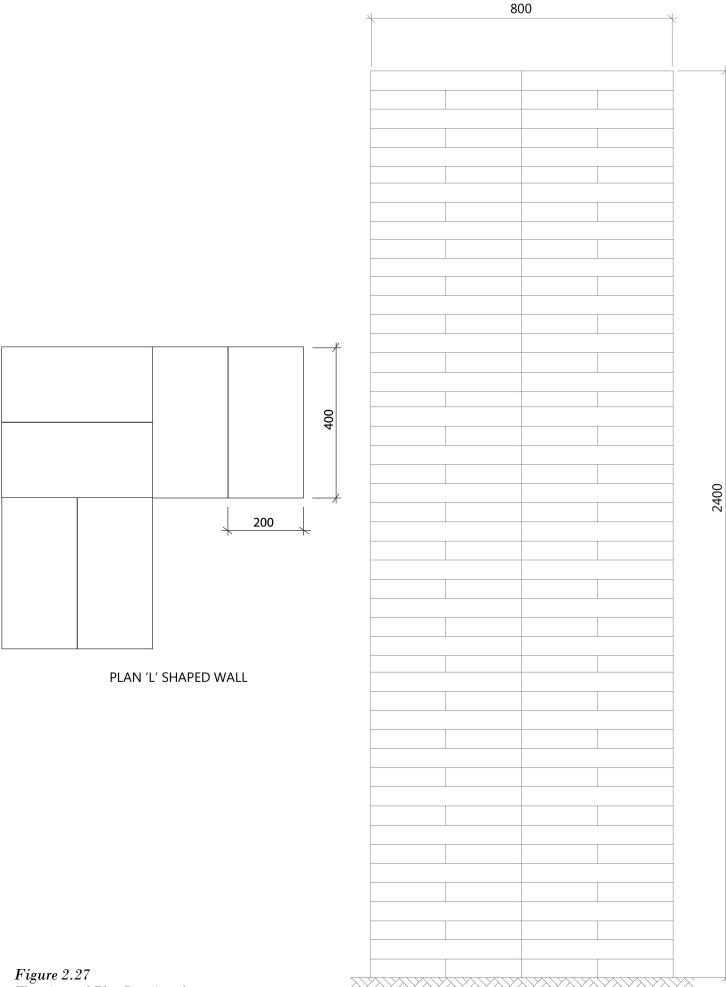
Elevation and Plan Drawing of 'L' Shaped Wall
